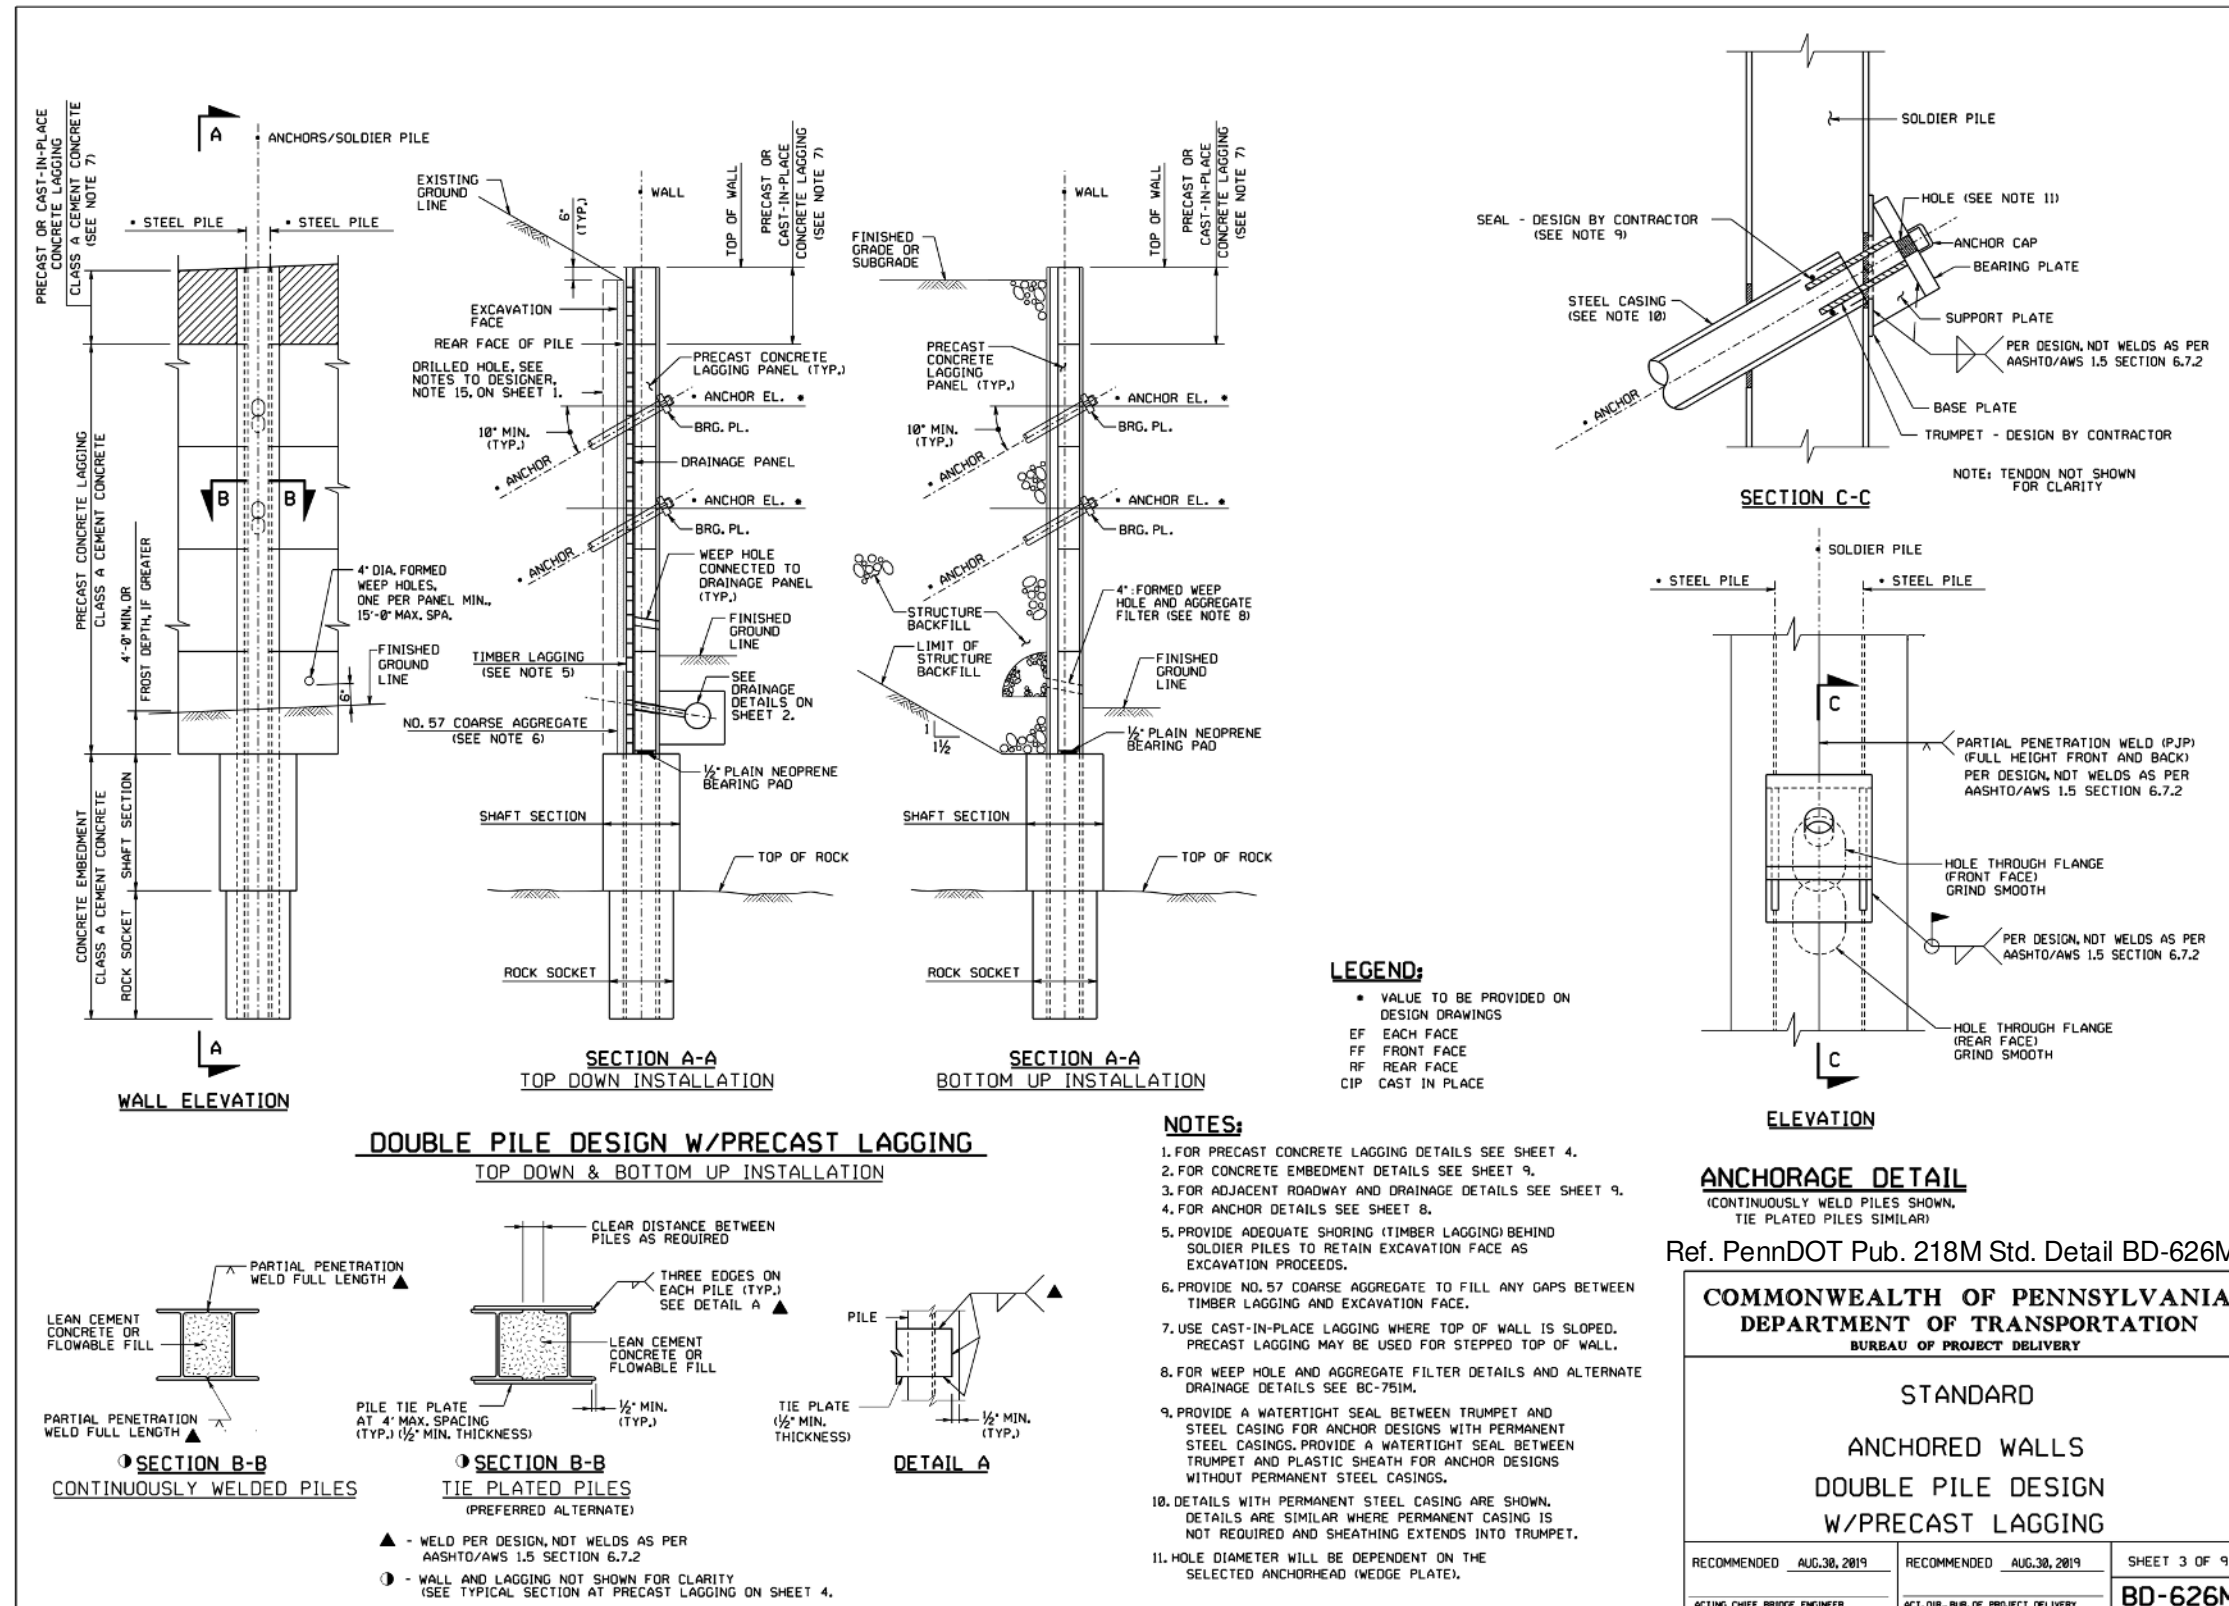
Typical Detail, Anchored Walls (Sheet 3 of 9)
